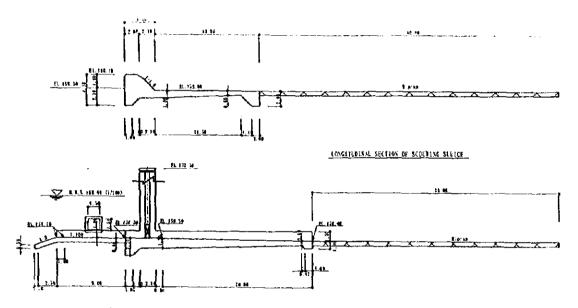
Longitudinal Section of the Huai Bang Sai Diversion Weir
